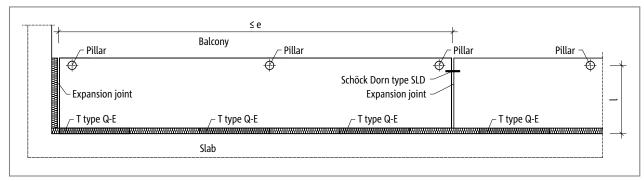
Schöck Isokorb® T type Q-E: Expansion joint spacing
